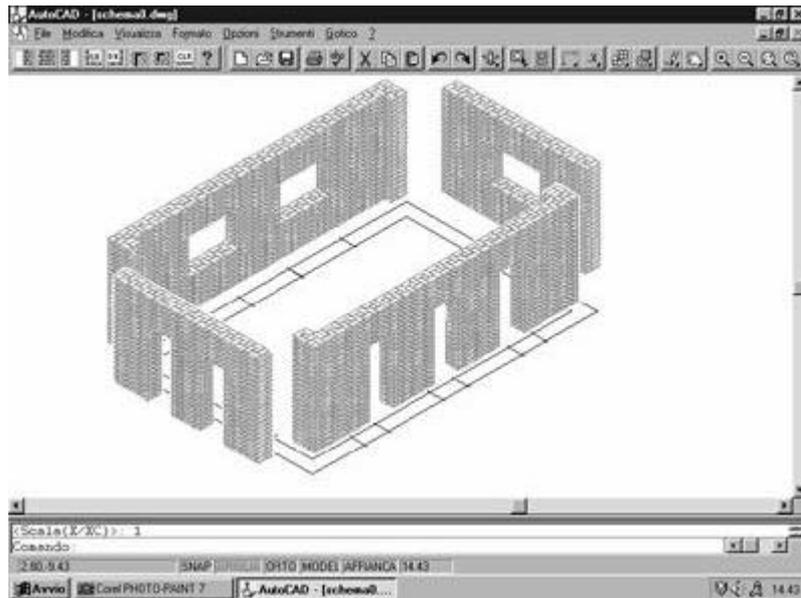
The complete external wall: exploded view. In this phase the general consistency control of opposite walls is made.
